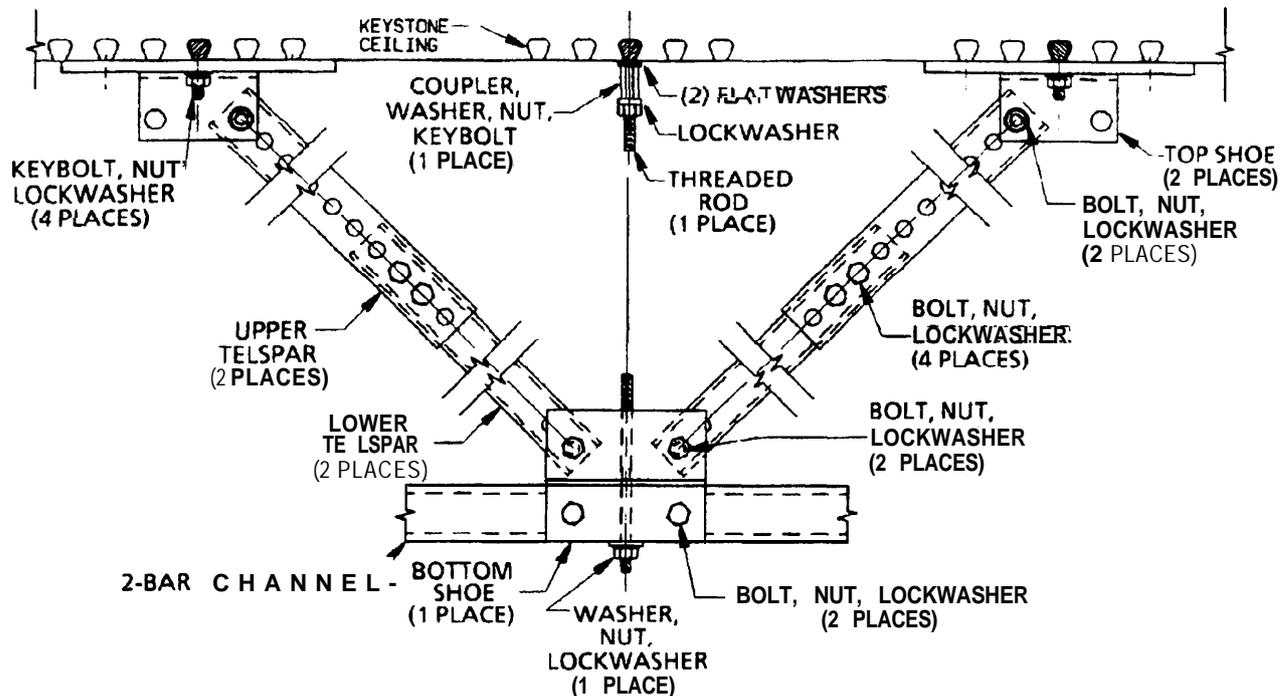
Typical V-Bracing with Thread Rod and TELSPAR Assembly.
